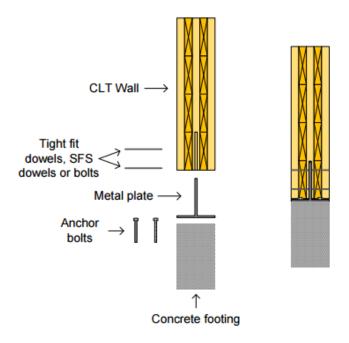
Internal/concealed metal plates wall to foundation connection. (Adapted from Mohammad 2011)
